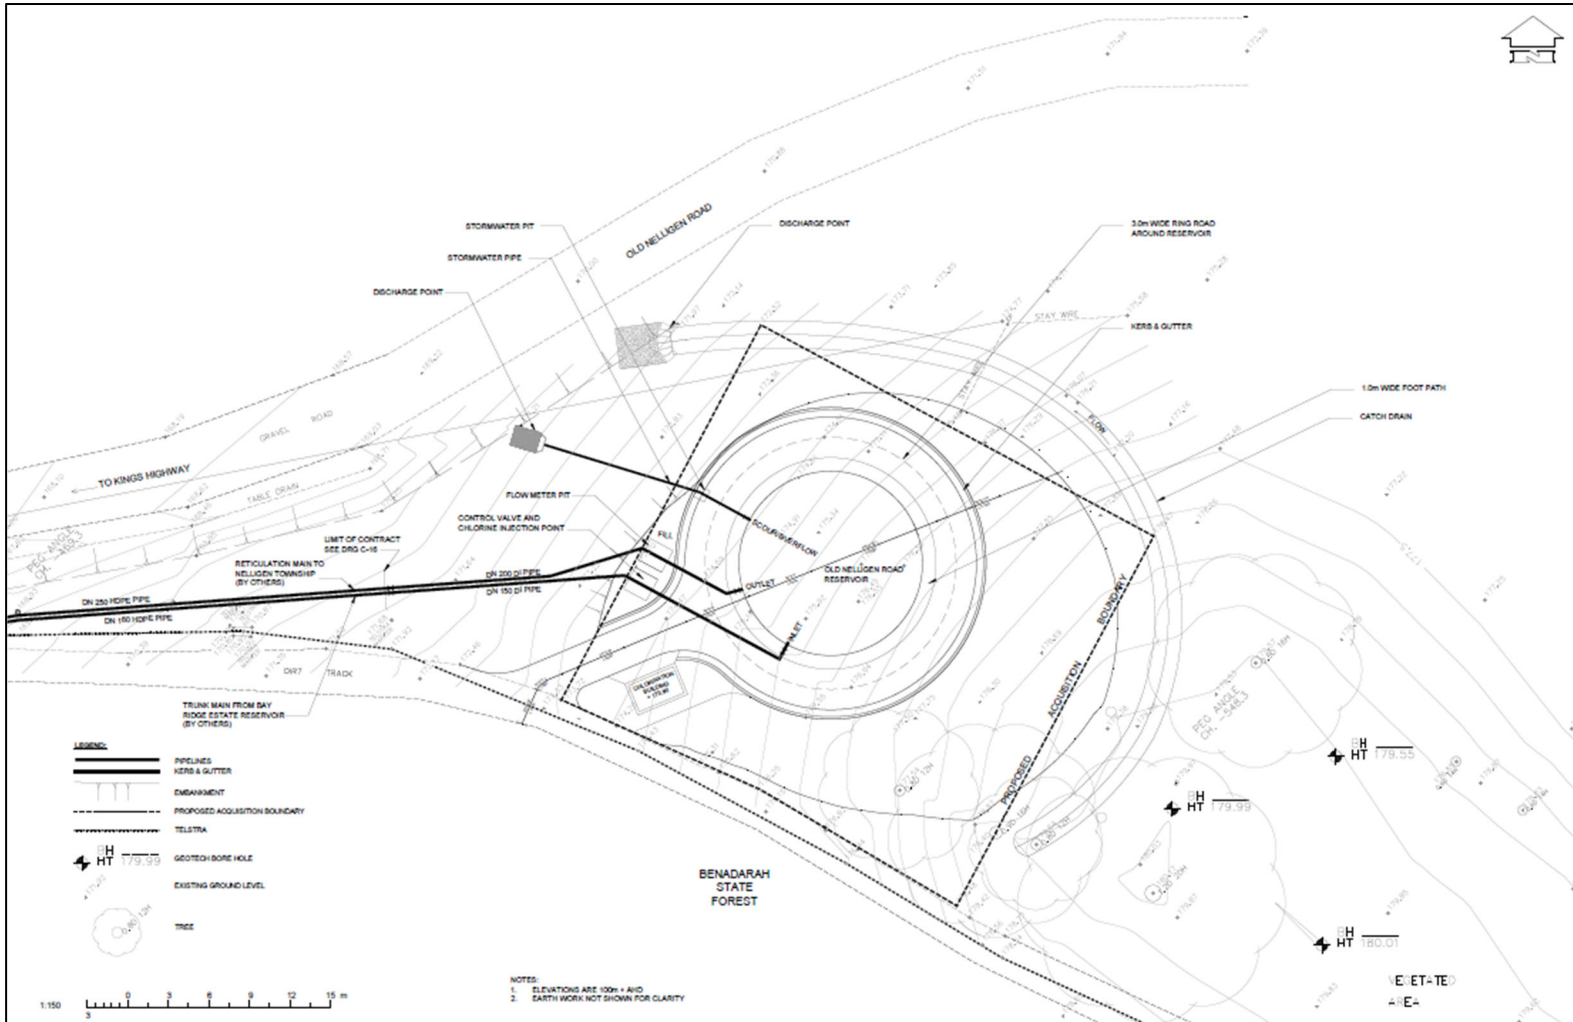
Proposed site layout plan of Nelligen reservoir (refer to Appendix E for annotations)
